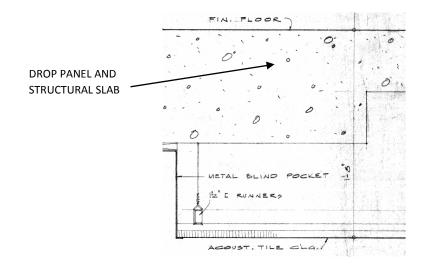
Section through typical floor in existing building. From A.12: Window & Wall Sections
